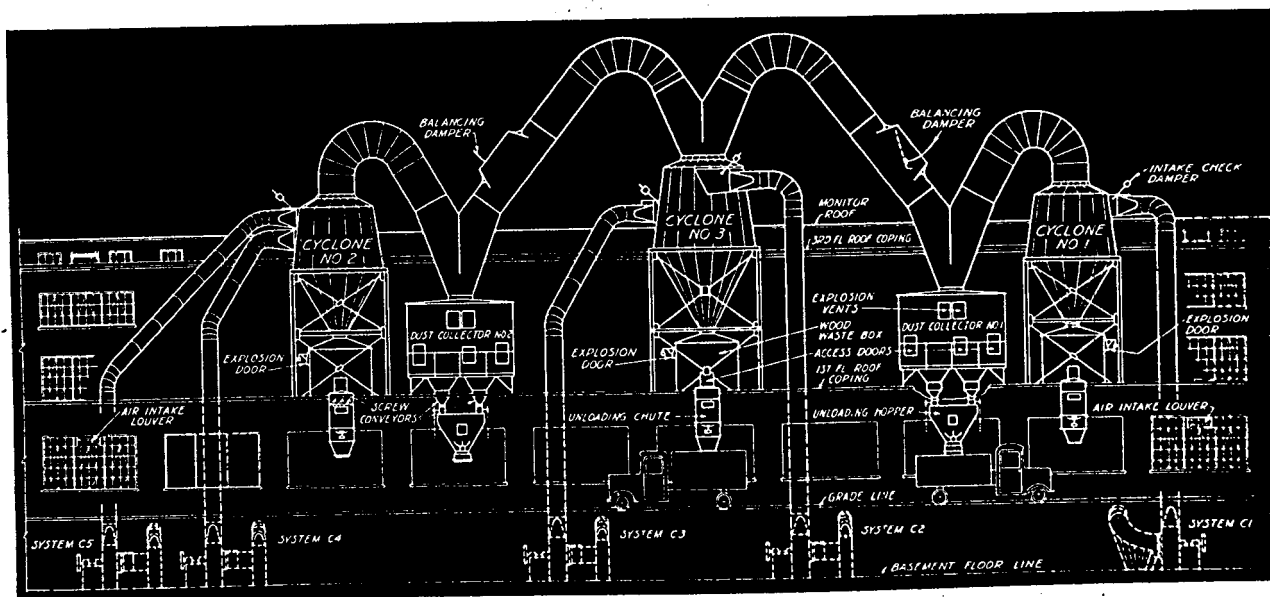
Elevation showing the external piping, dust collecting equipment, and unloading stations.
